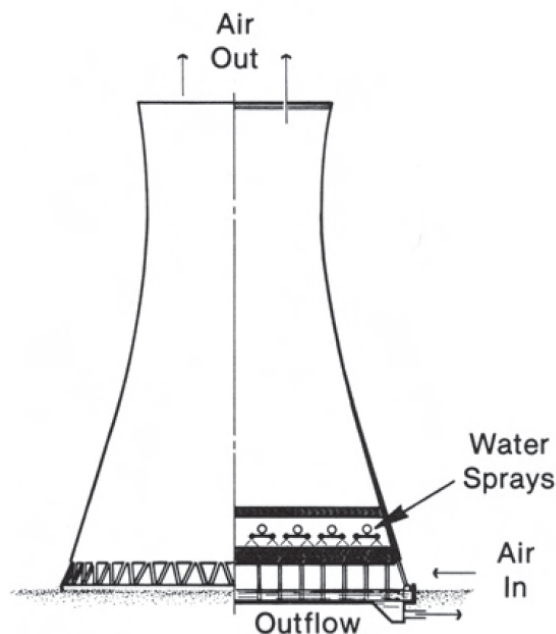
Cross-sectional View of a Typical Natural Draft Cooling Tower (Image Courtesy of Marley/SPX)
